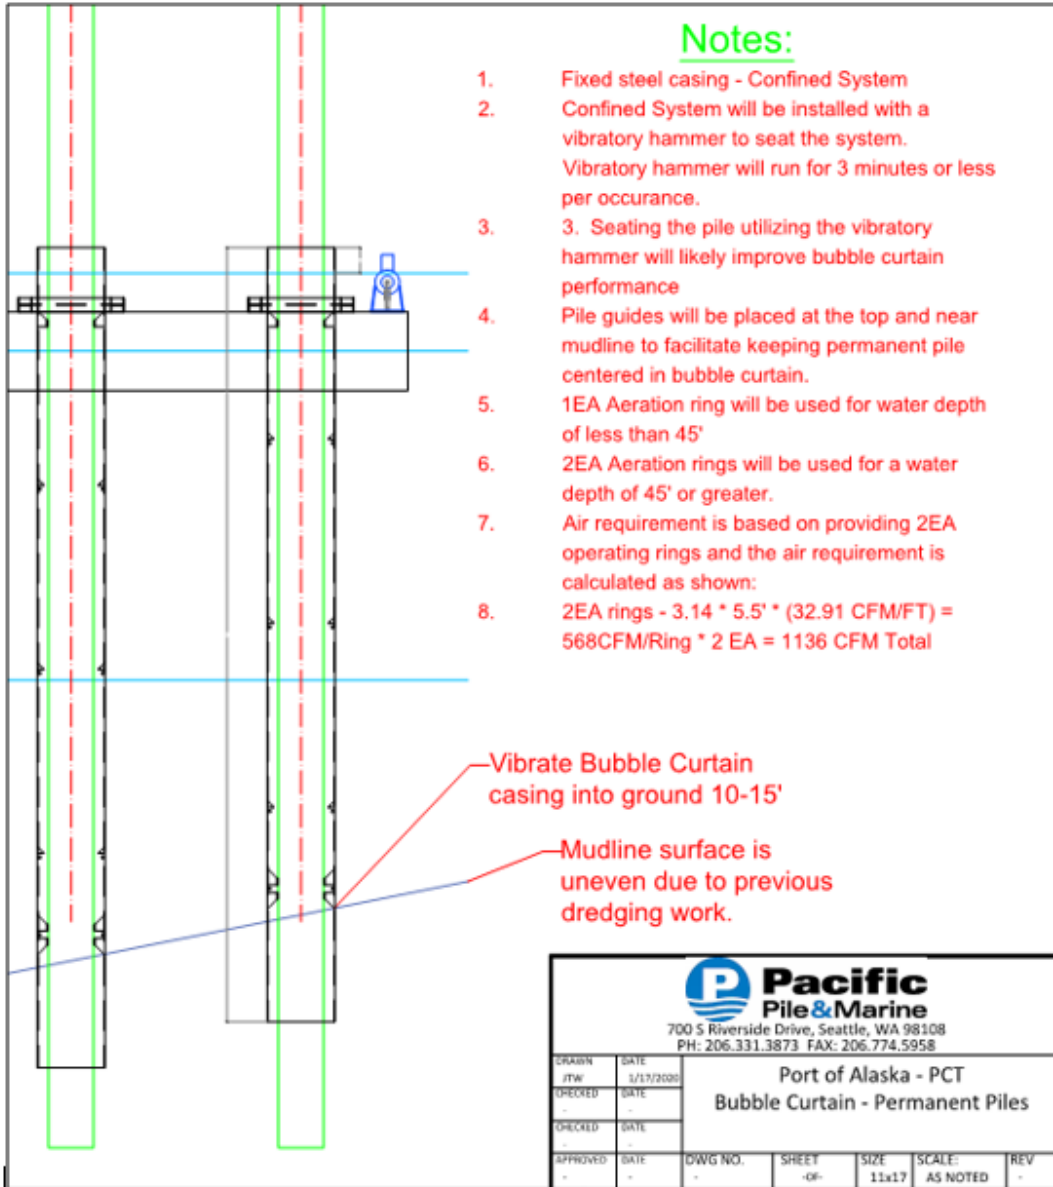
Diagram of pile and confinement system for the 48-in piles, showing arrangement requiring vibratory installation of confinement and separate advancement of pile.
